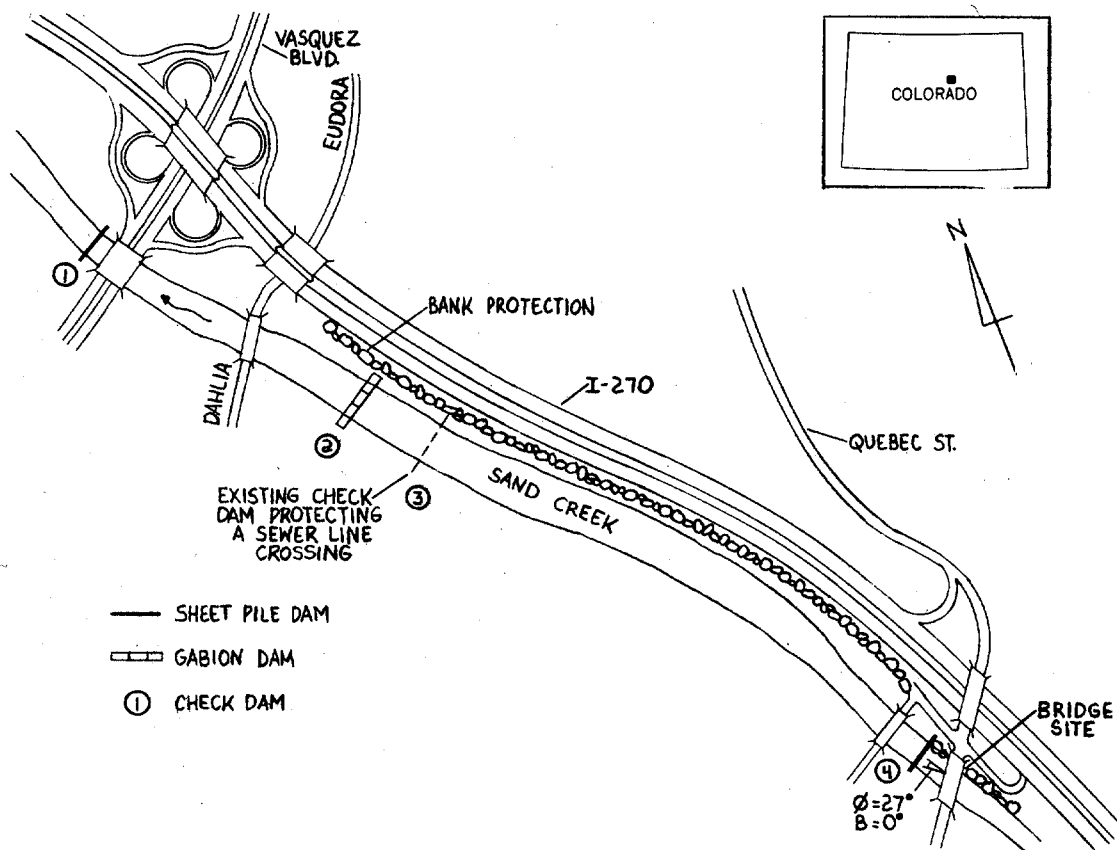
Location of check dams and bank stabilization works on Sand Creek in the vicinity of Quebec Street bridge, Denver, Colo.
